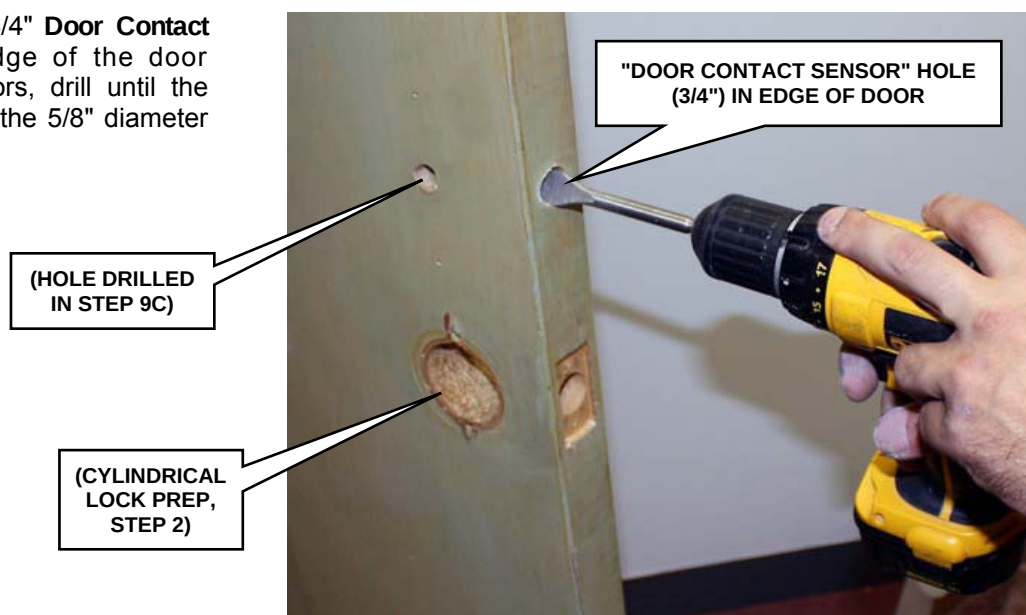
D: 3/4" DOOR CONTACT SENSOR HOLE IN EDGE OF THE DOOR
